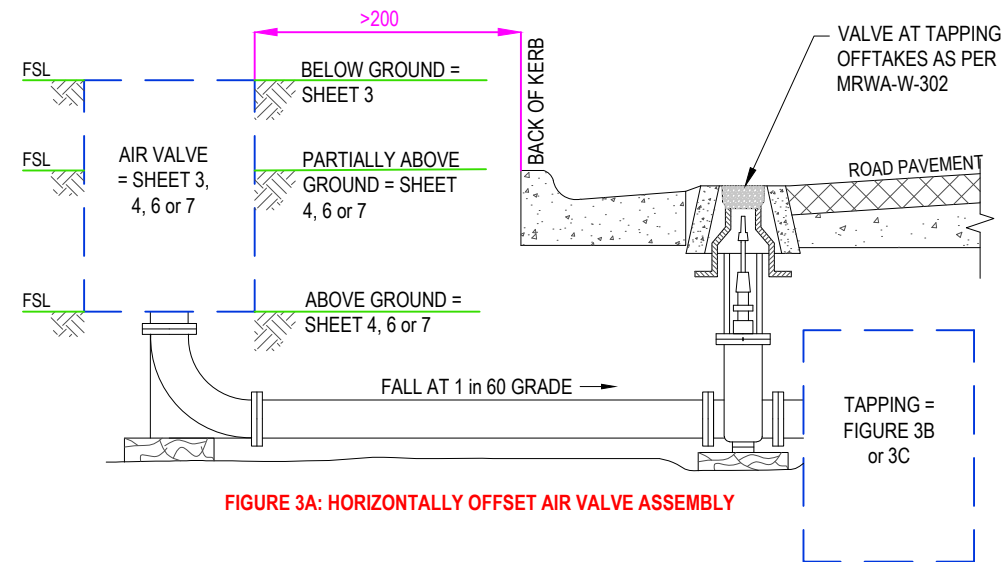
A: HORIZONTALLY OFFSET AIR VALVE ASSEMBLY
